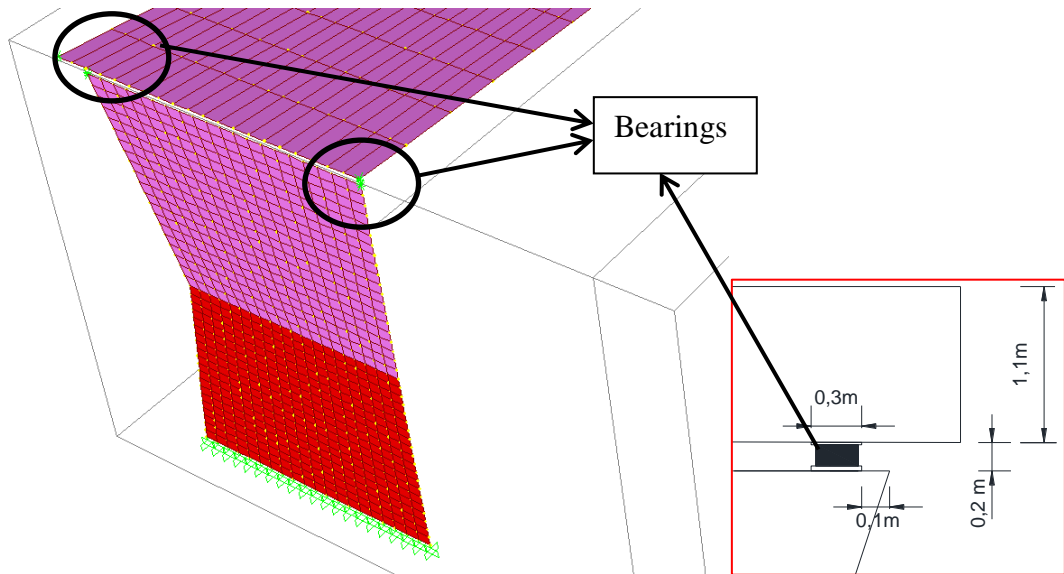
View of Bearing Connections between Abutment and Bridge Deck
